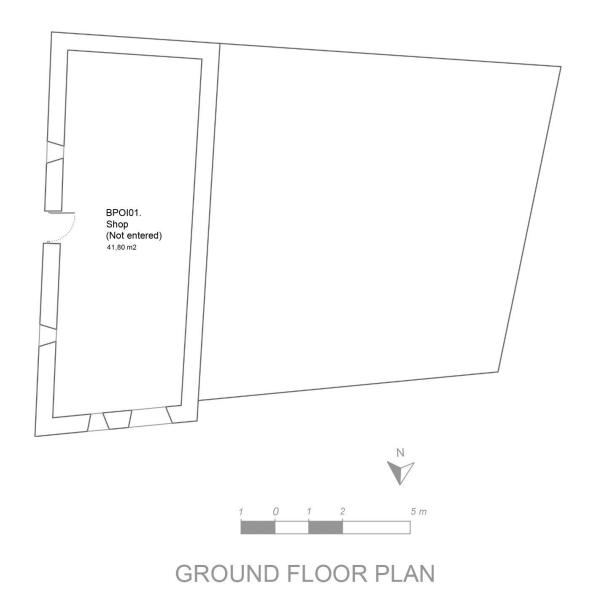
Post-intervention ground floor plan of Çakırlar house (Author, 2023)
